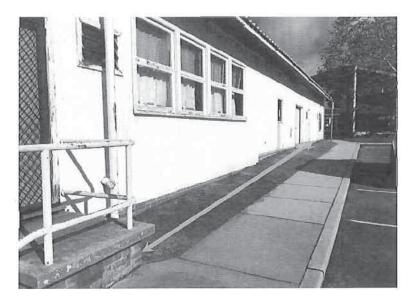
Exterior surrounding soil surfaces after removal of lead paint debris
